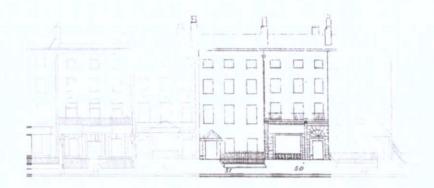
Elevation of 50-51 Sackville Street Upper from Shaw's Directory of 1850
